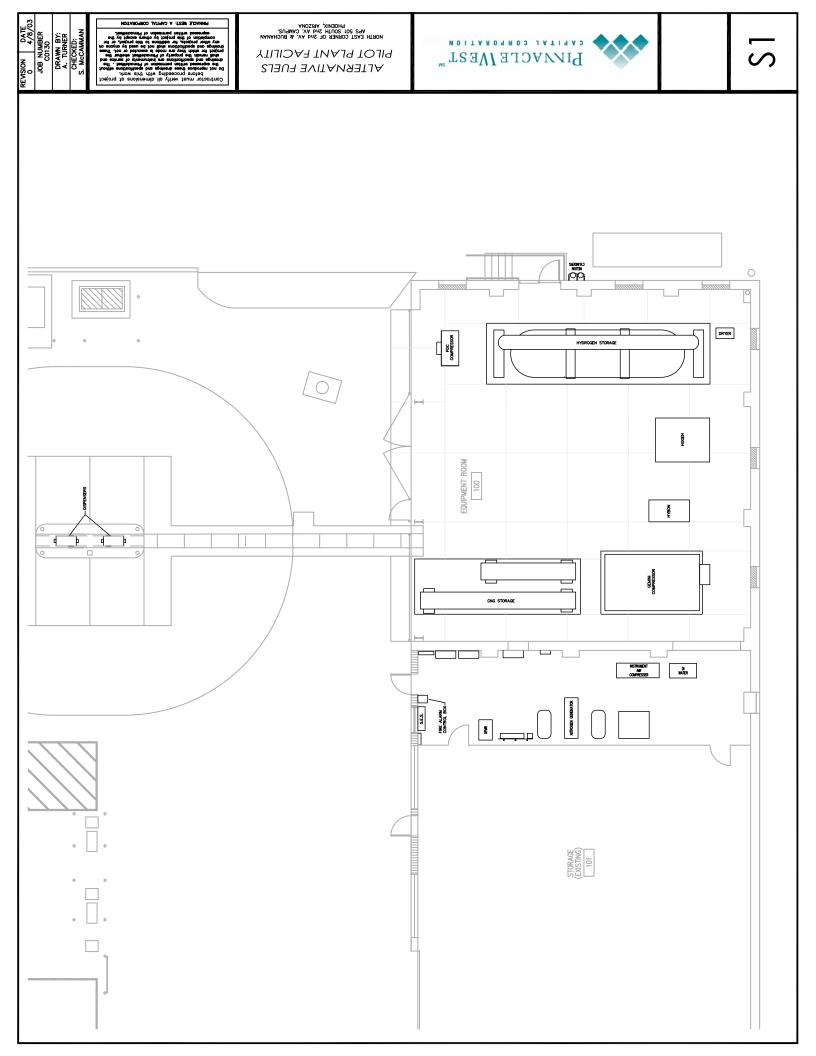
APS Alternative Pilot Plant Production Equipment Plan
